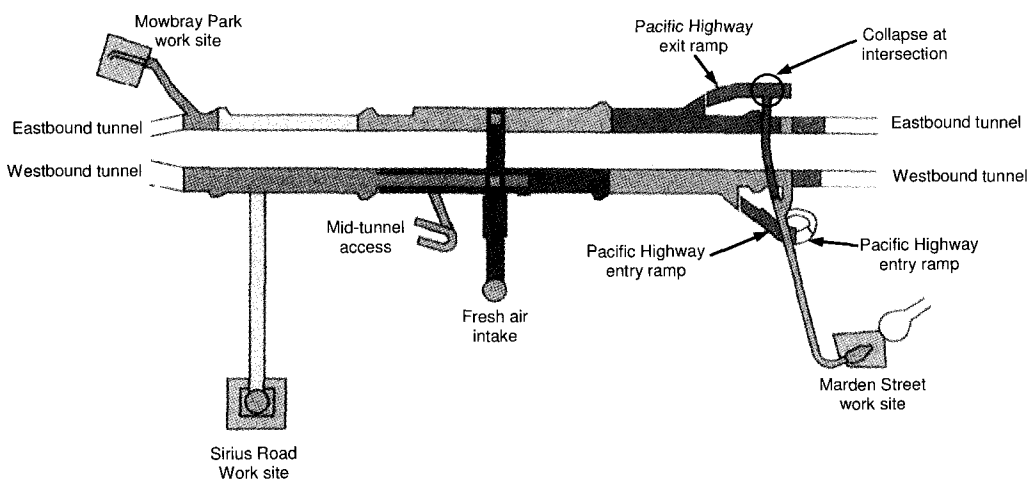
Tunnel schematic, Lane Cove Tunnel Project (Rozek, 2005).
